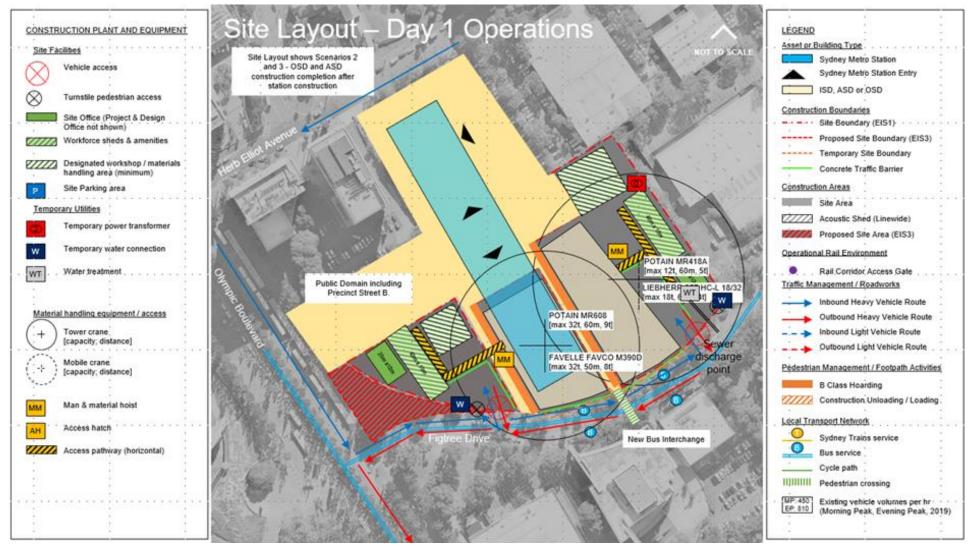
Proposed site layout – Day 1 operations Scenario 2 and 3
